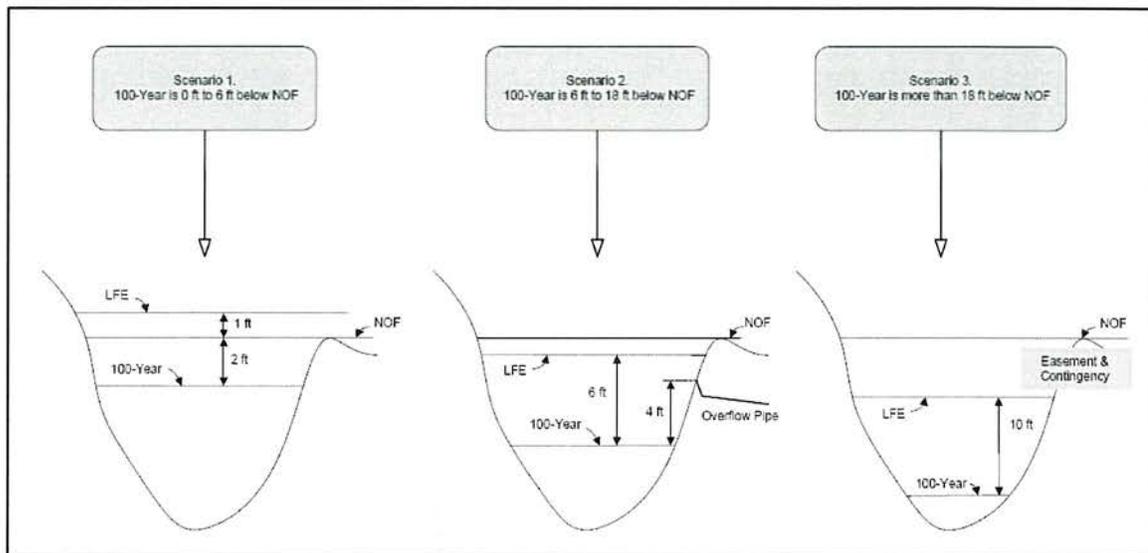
Lowest Floor Elevation Standards for Landlocked Basins
